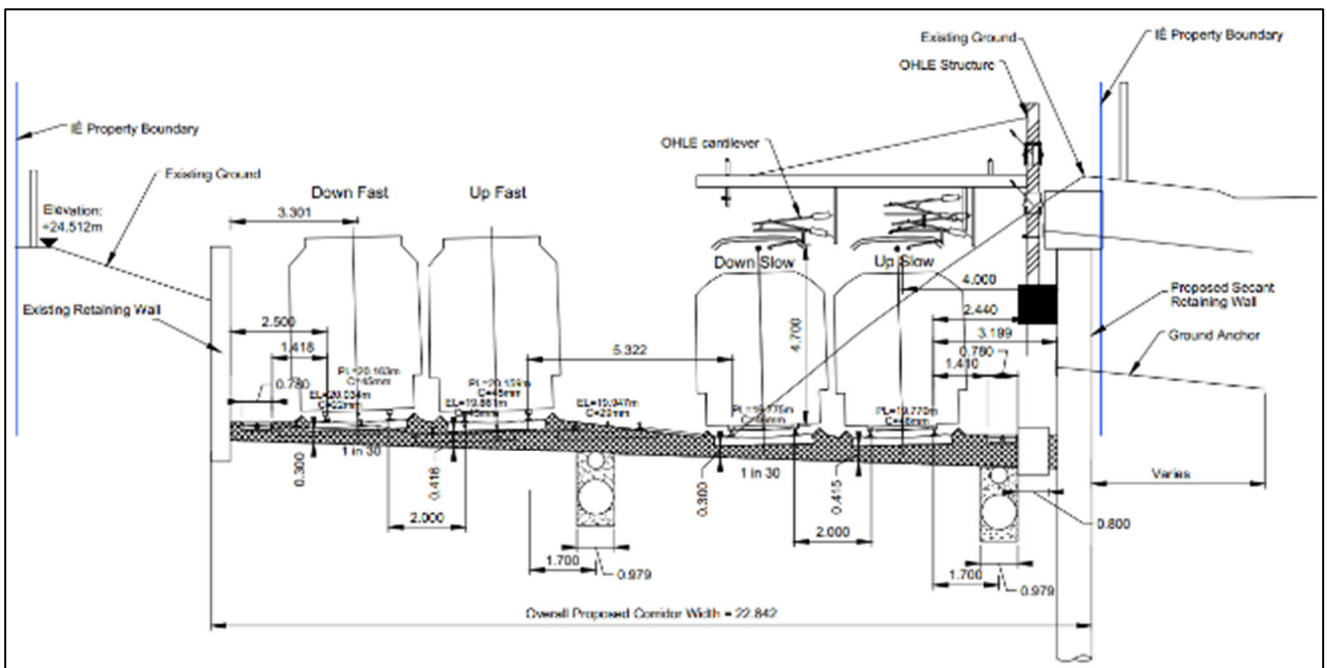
Cross section at Ch 10+103 - West of Memorial Road Bridge (OBC3) - Facing West
